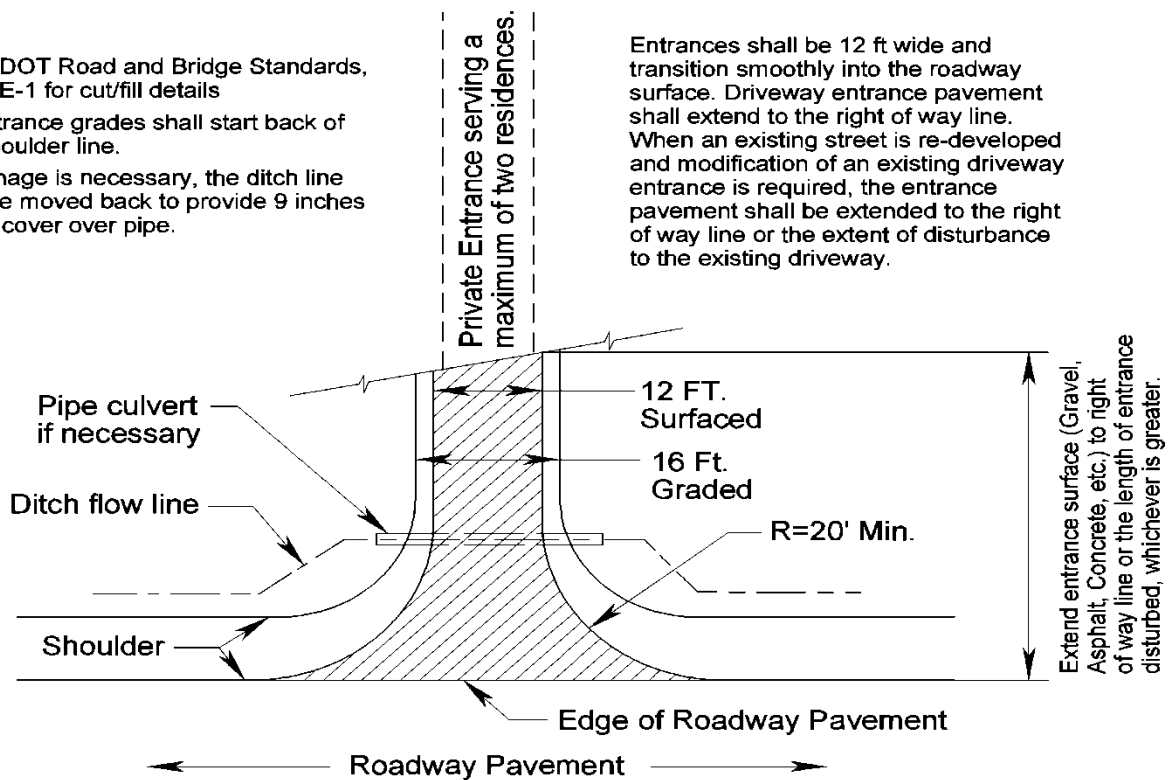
PRIVATE ENTRANCE DETAIL \
